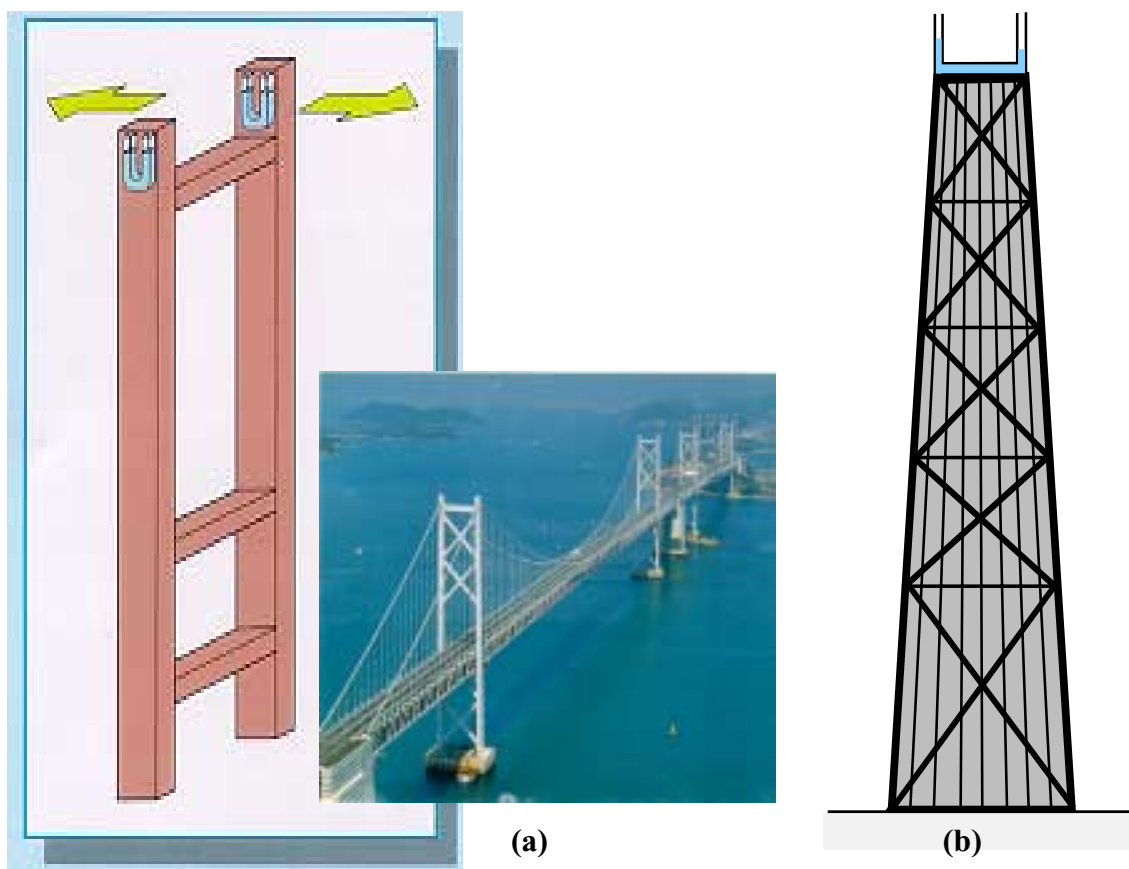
Implementation ideas for tuned liquid dampers (a) bridge towers (b) tall buildings.
